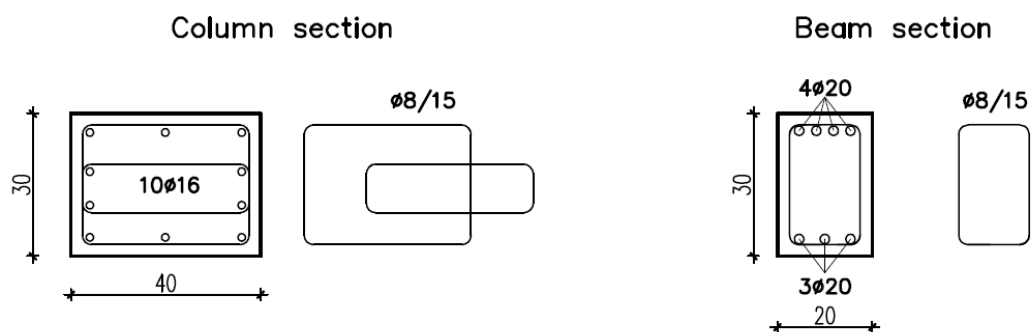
Dimensions and reinforcement of columns and beams of R/C frames.
